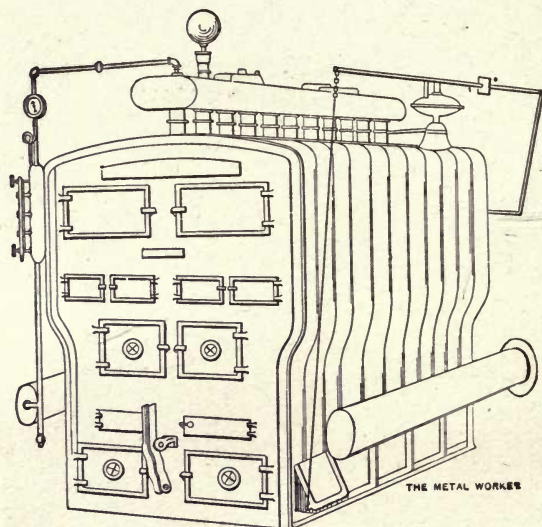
Sectional Cast Iron Boiler with Vertical Sections.
